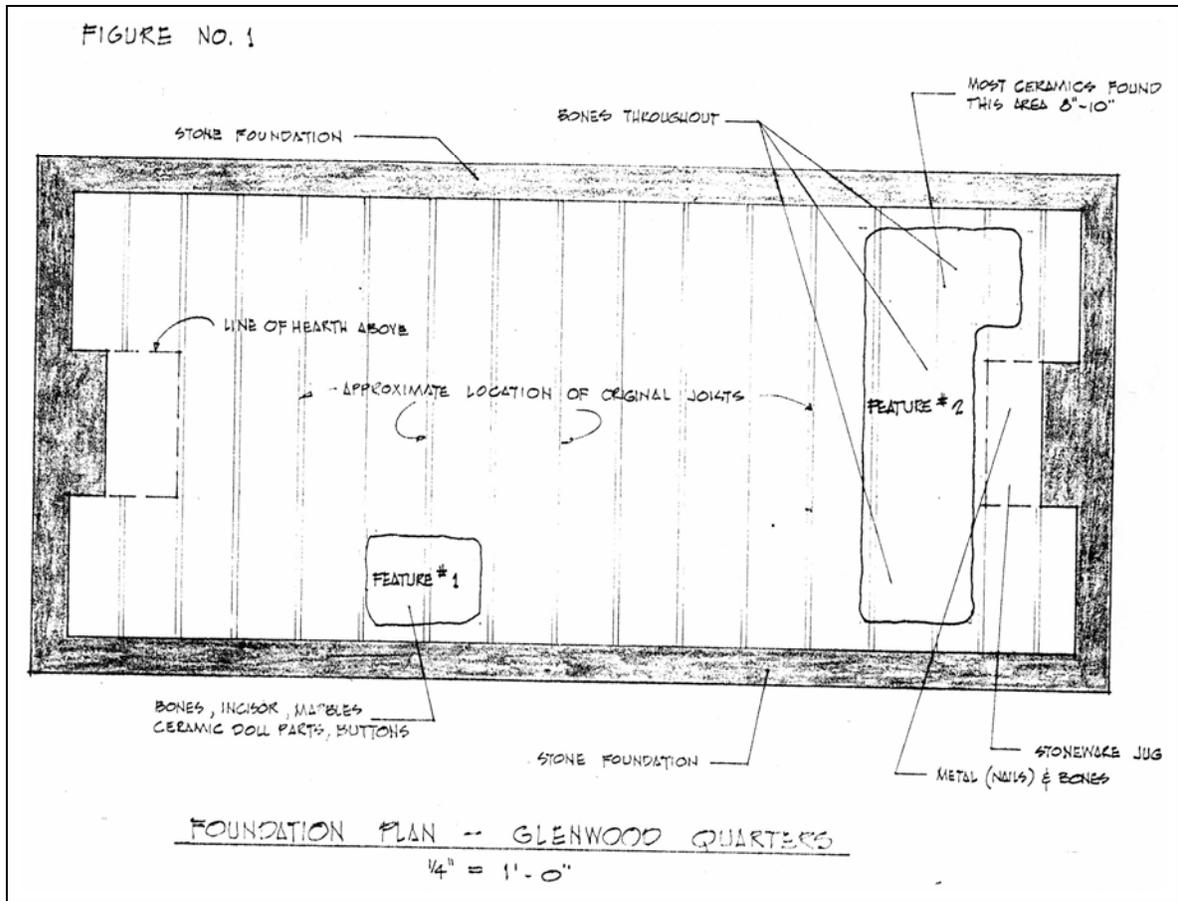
Excavation Plan, Glenwood Quarters (Paul D. Marshall n.d.)
